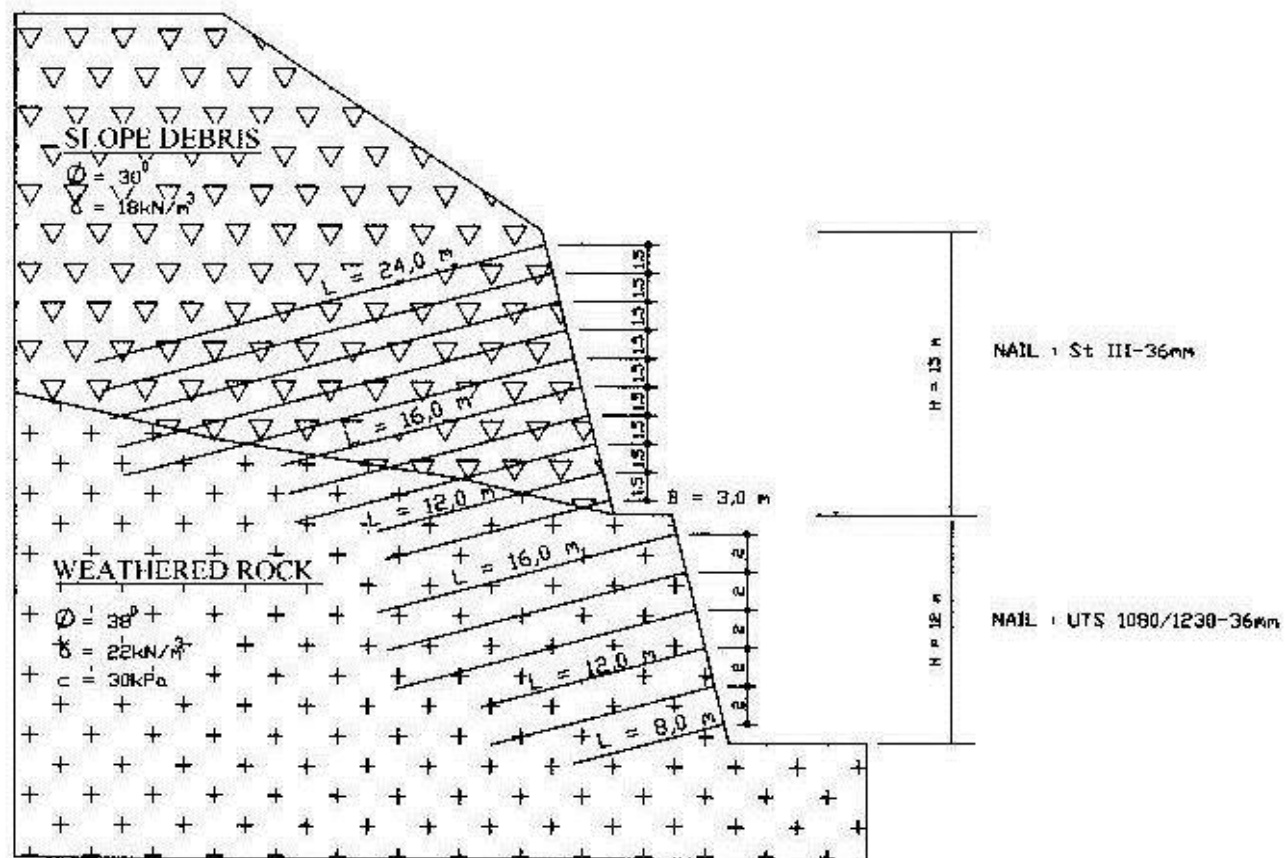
Soil nail design for excavation in Northern Slopes between KM 15 + 060 - KM 15 + 187 (H=27m)
